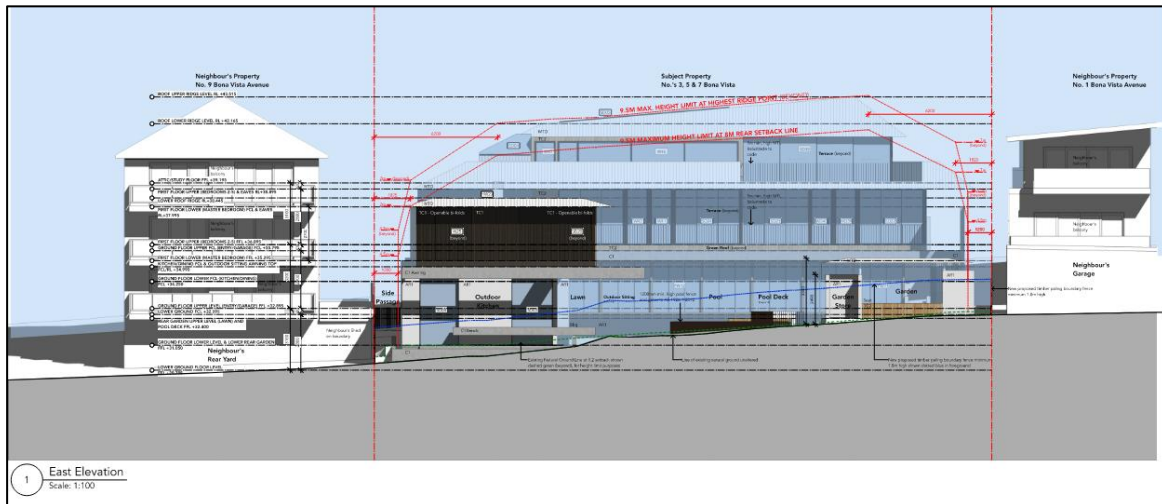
Original Proposal at Subject Site - East Elevation – (appearance from the rear) (Source: Dominic Levene)
